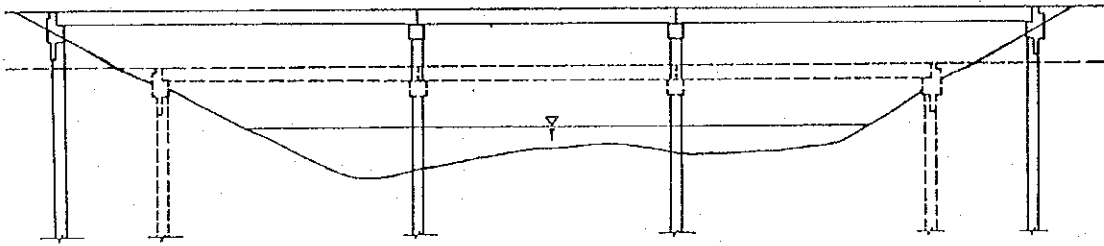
Illustration of Bridge Elevation Raising Method(2)
